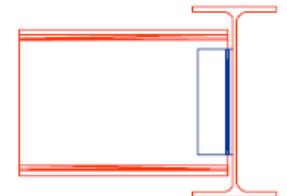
Shear Connection: All-welded double-angle
